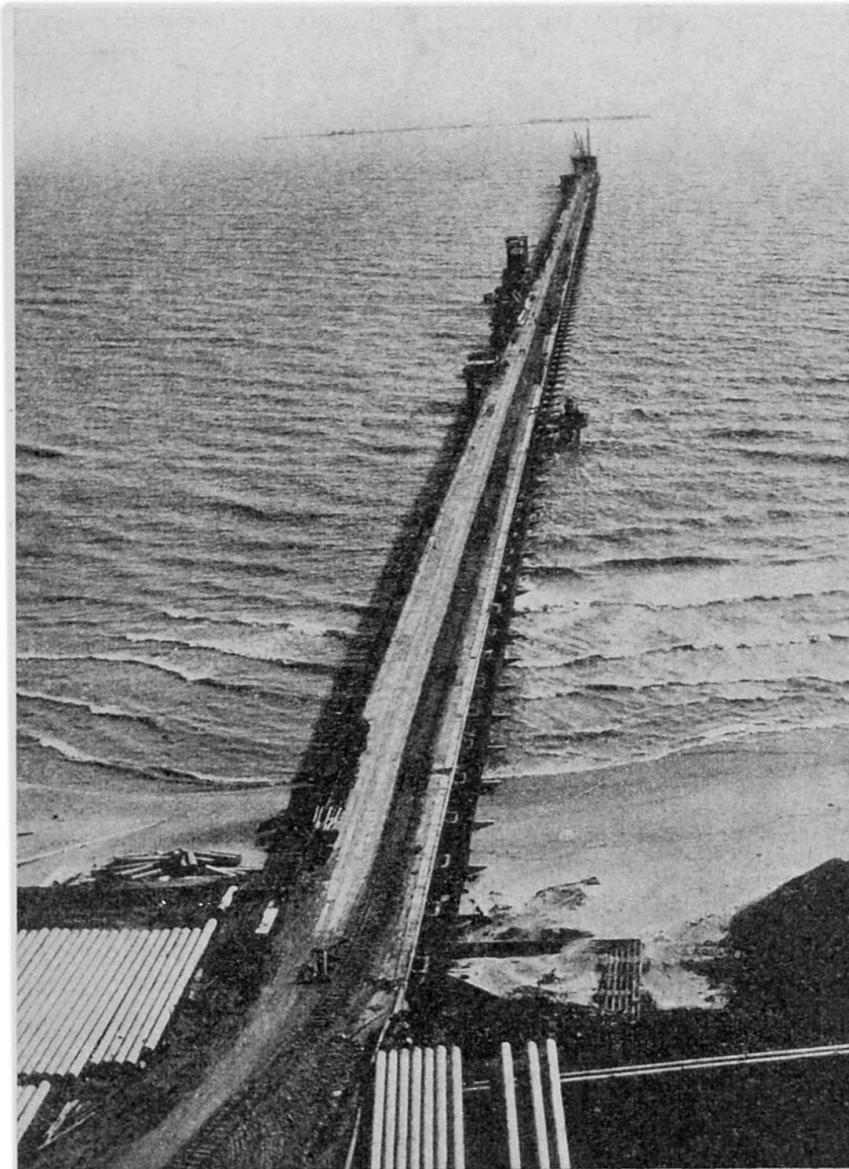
ANIC loading dock at Gela, Sicily. Prestressed foundation piles (Impresa Vianini).
